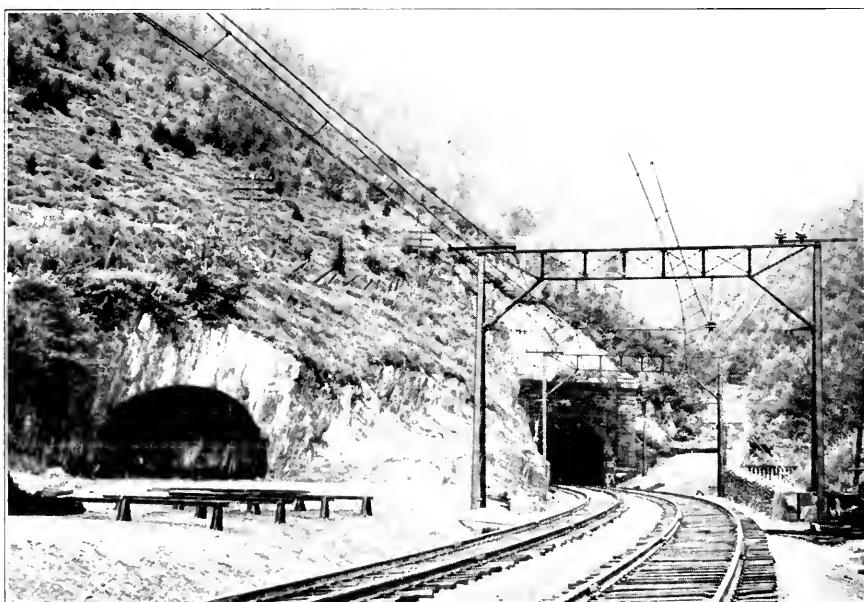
PLATE IV. EAST PORTAL HOOSAC TUNNEL, BOSTON & MAINE RAILROAD.
